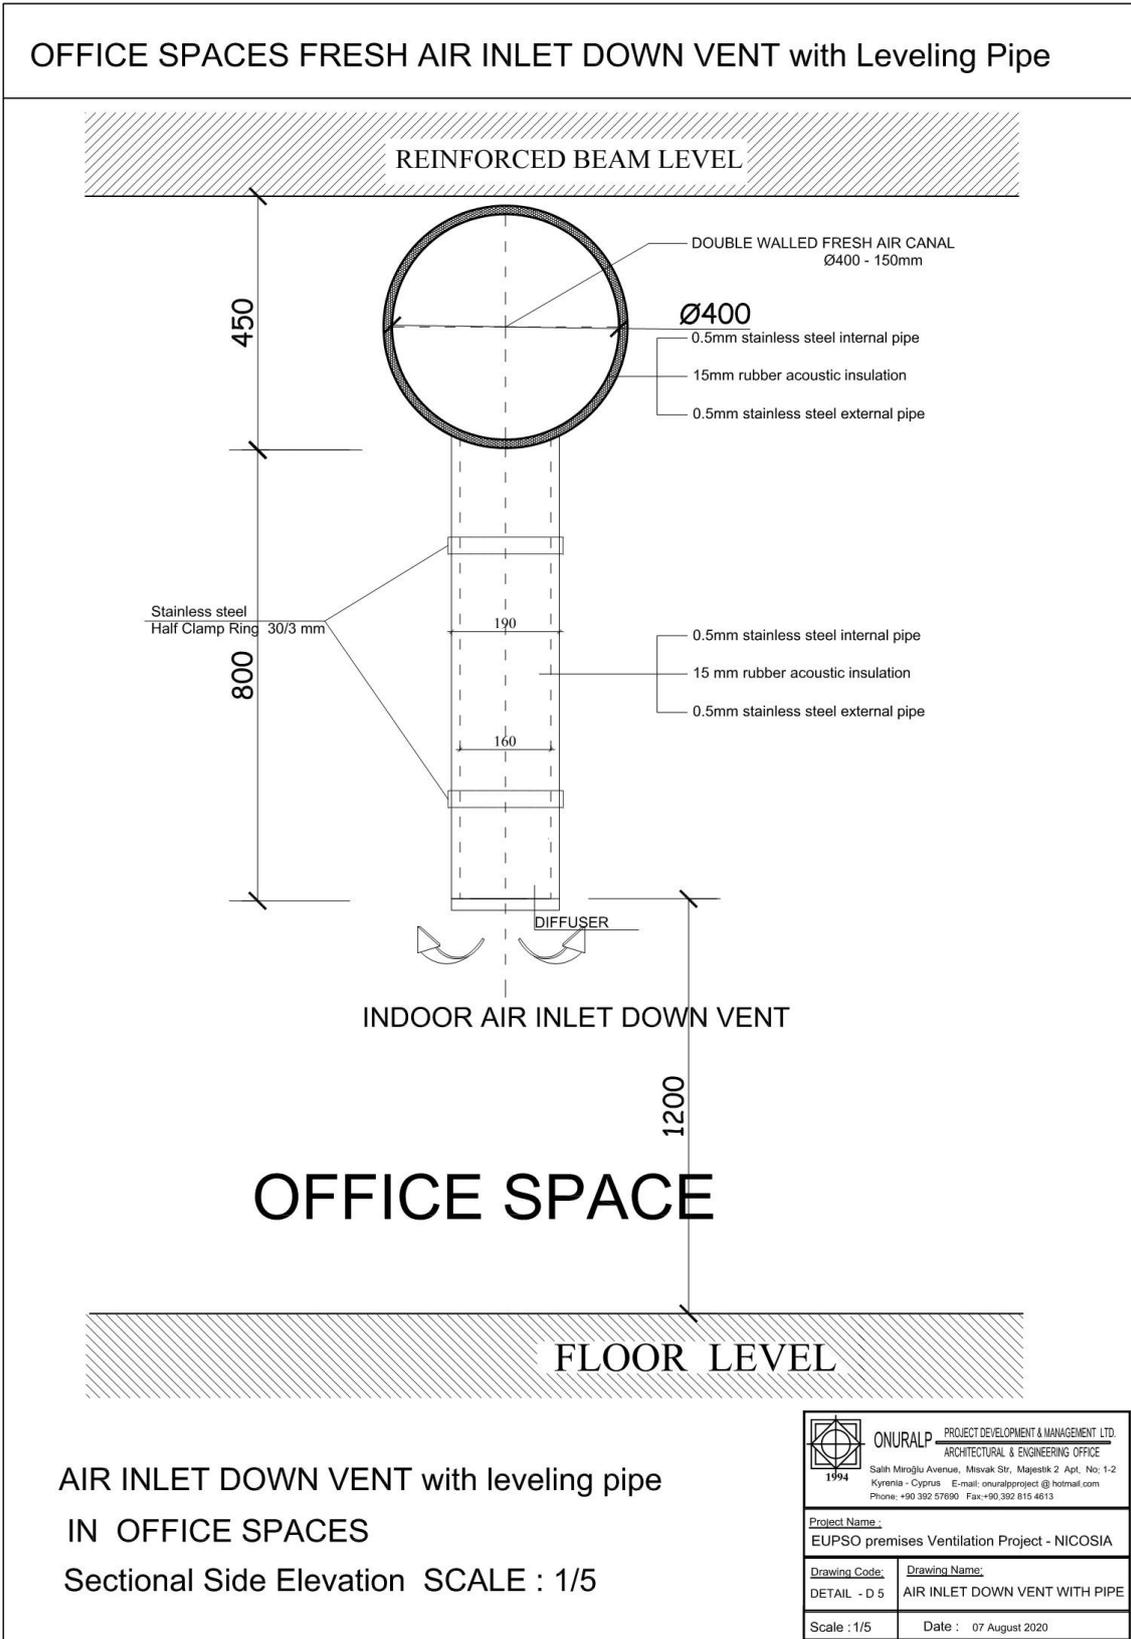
Fresh Air Inlet Down Vent – EUPSO project detail no:5
